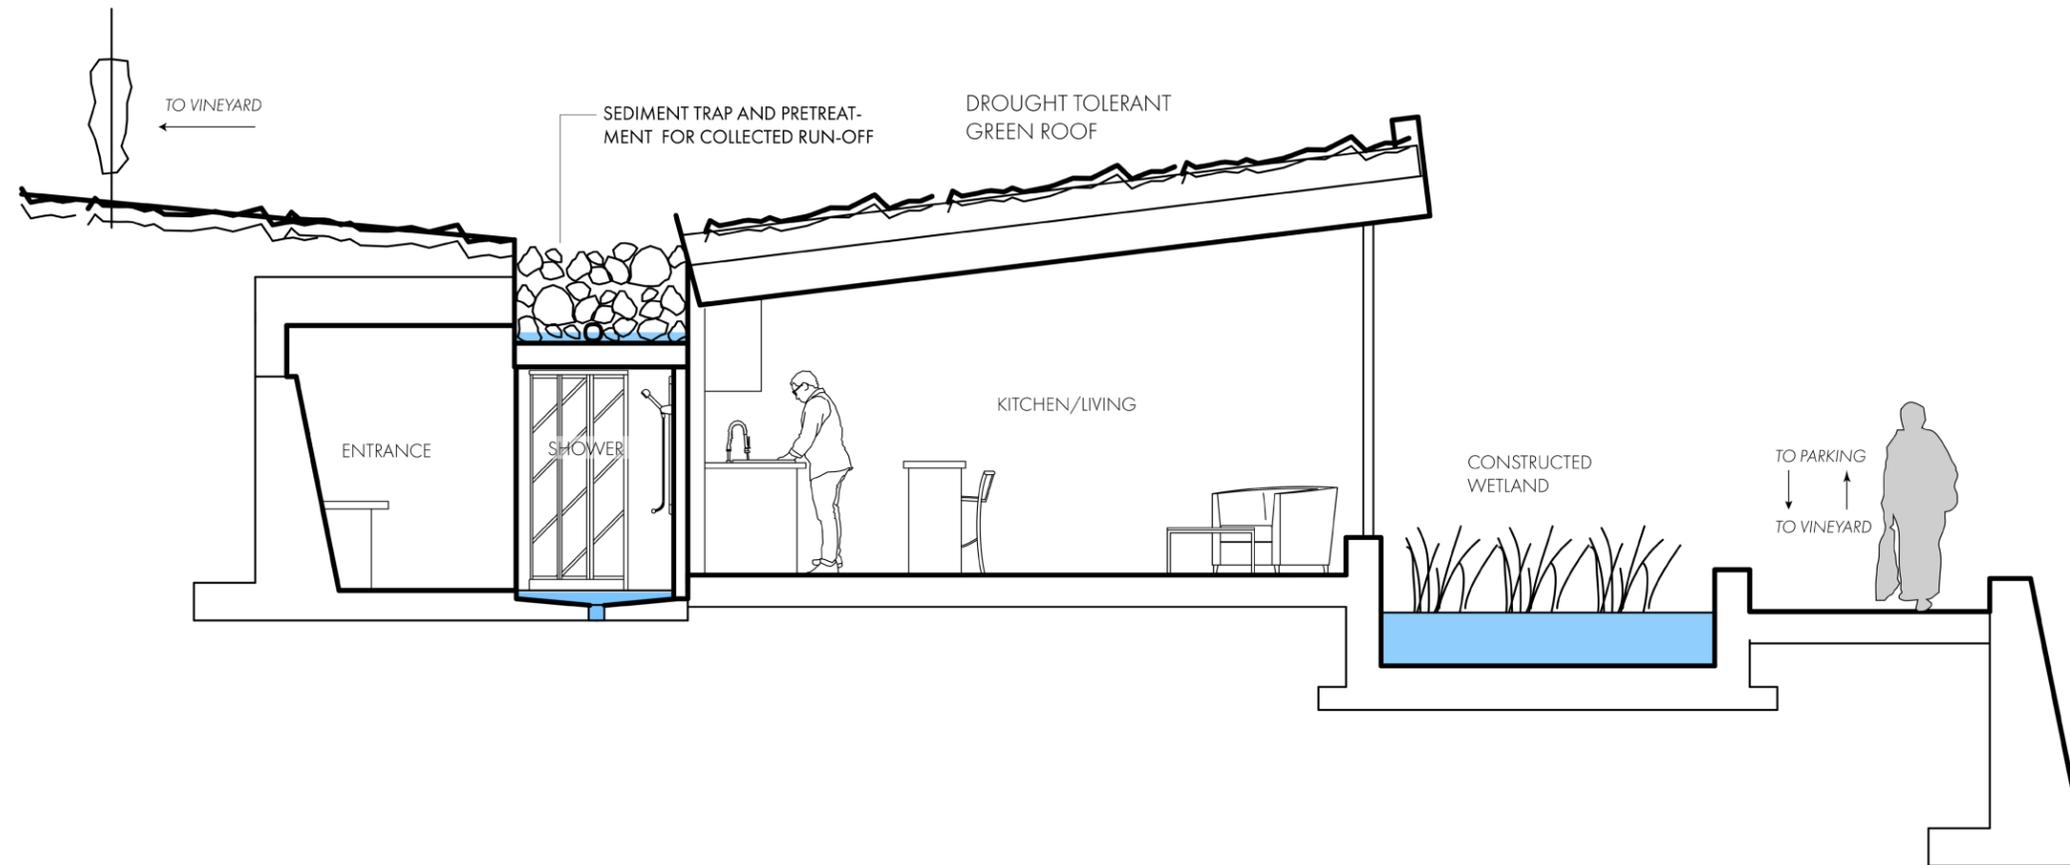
1:100 TEANSVERSE DWELLING SECTION
